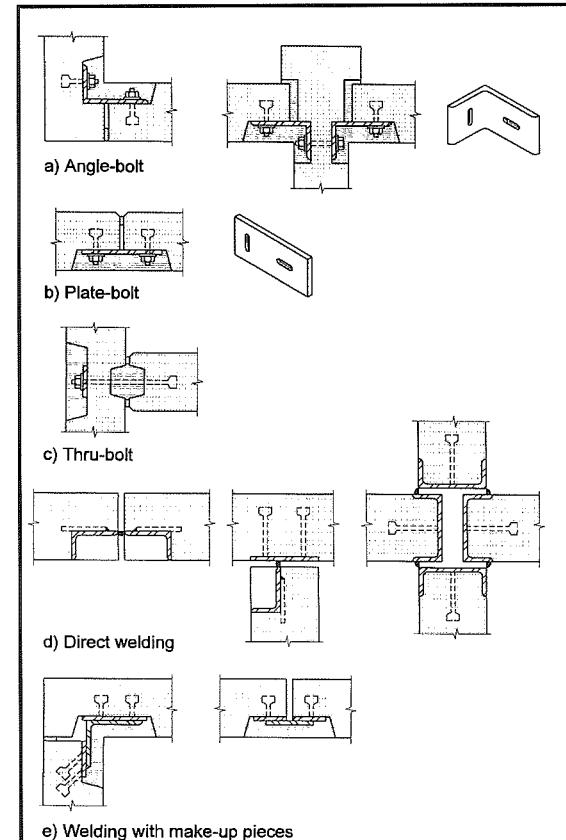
Mechanical Connection In Vertical Wall Joint
